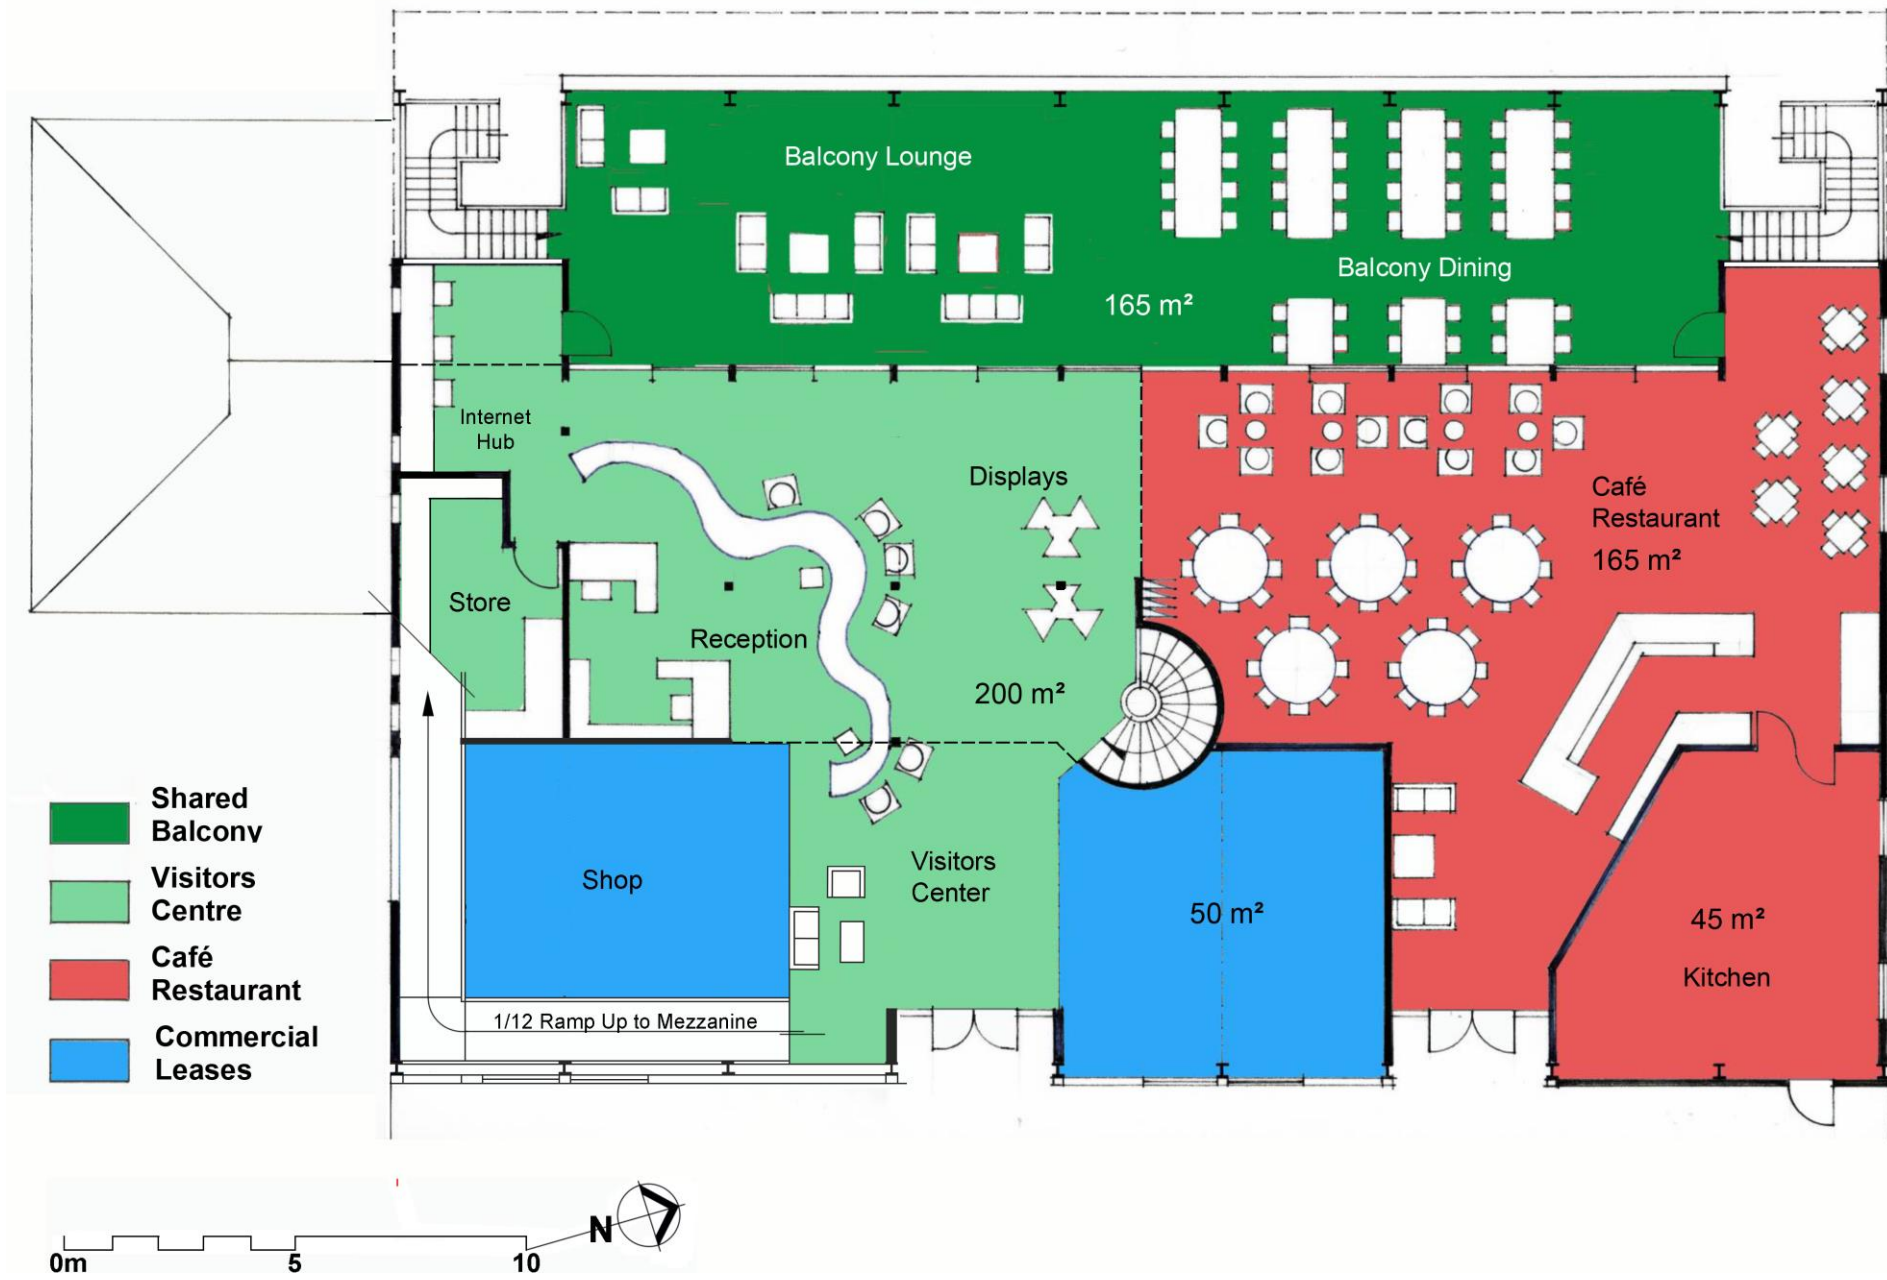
UPPER GROUND - GAZE ROAD FLOOR PLAN
